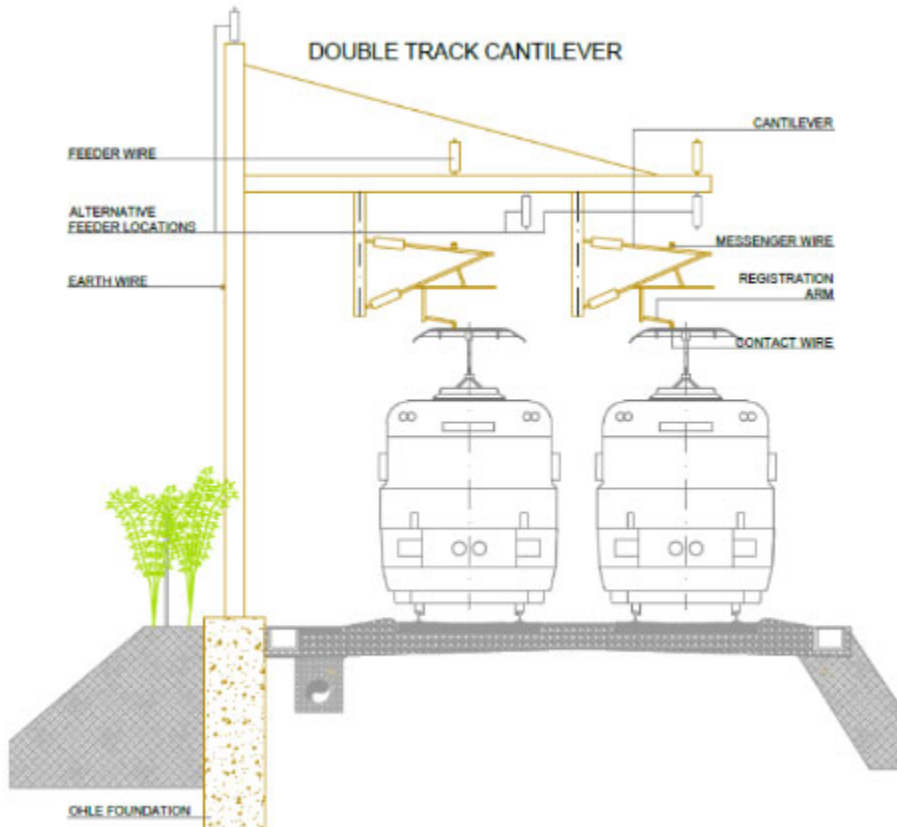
Twin Track Cantilevers (TTC) in 2-Track Section
